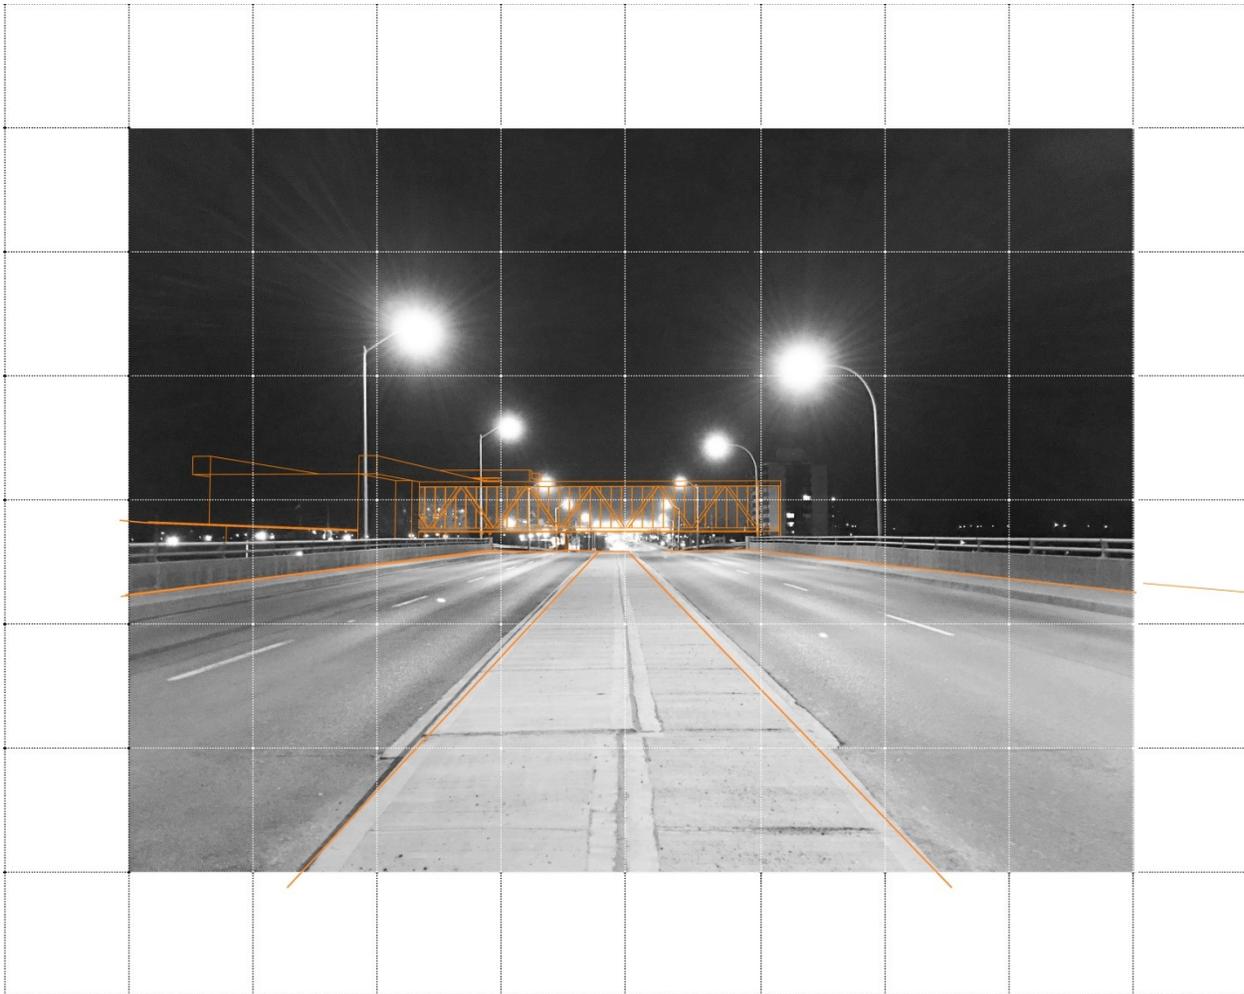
View of the pedestrian bridge over Bank Street, connecting Home Depot to the opposite side of the street
